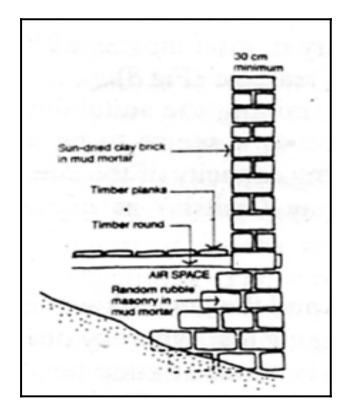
Typical Cross section – Battered wall Source: Solar Architecture & Earth Construction in the Northwest Himalayas
